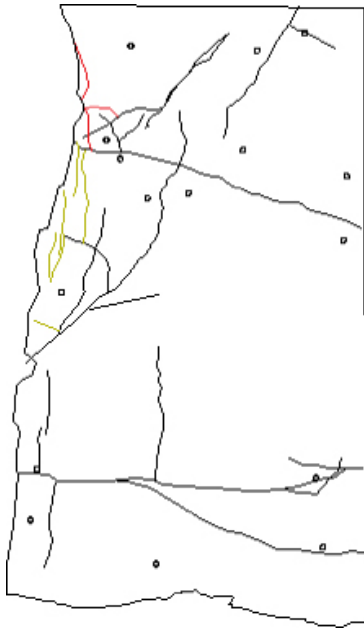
Digitized slab surface with fractures, fix point markers and edges, 36B-05.
